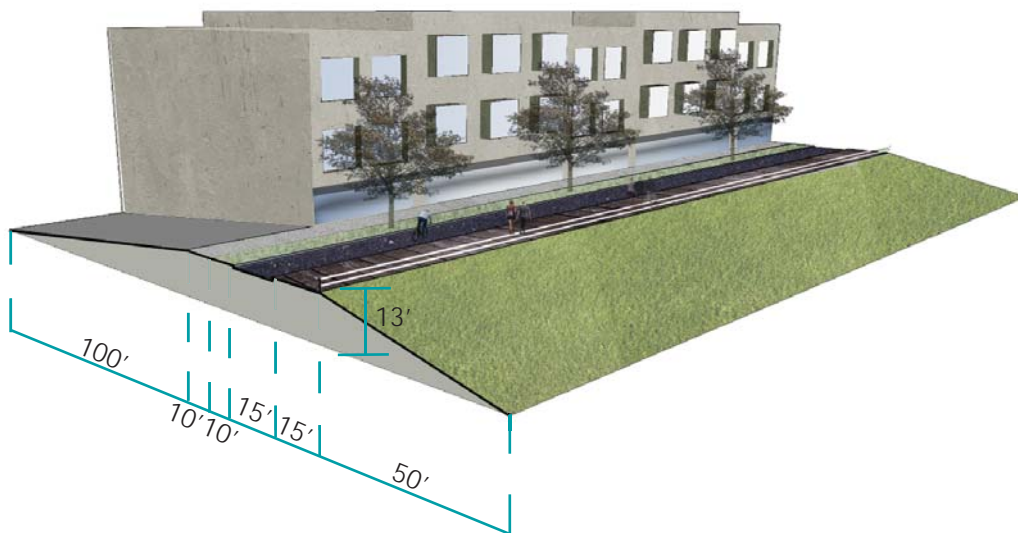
Detail of berm and pedestrian promenade.
